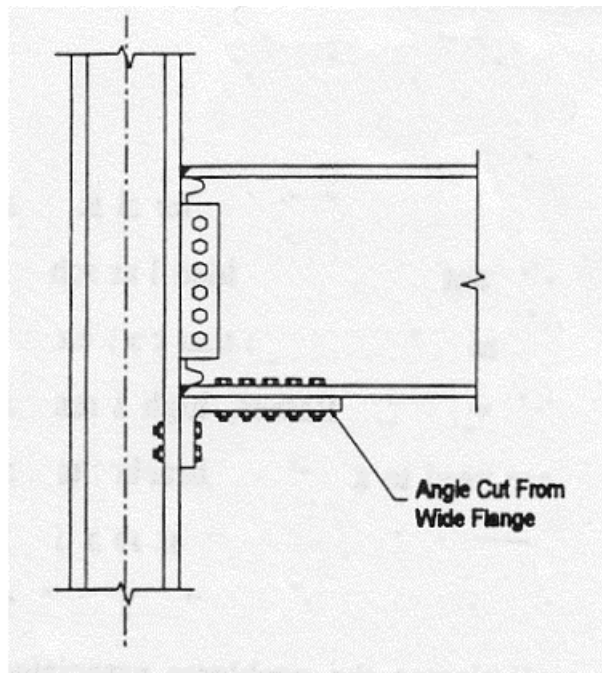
Bolted Bracket Connection, Angle Type
